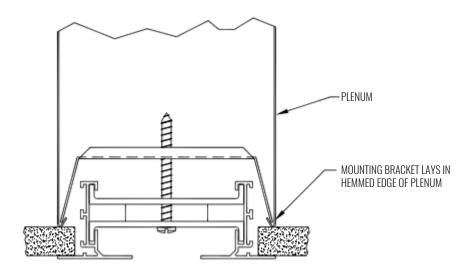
Installed DFL in Hard Ceiling Application with Concealed Fastening
